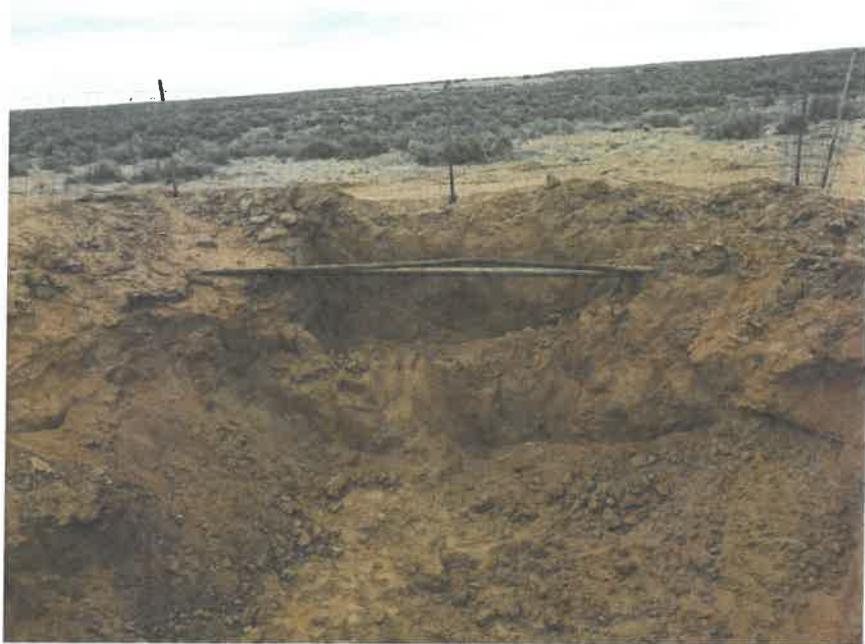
BGT excavation facing northeast. Photo taken December 21, 2018.
